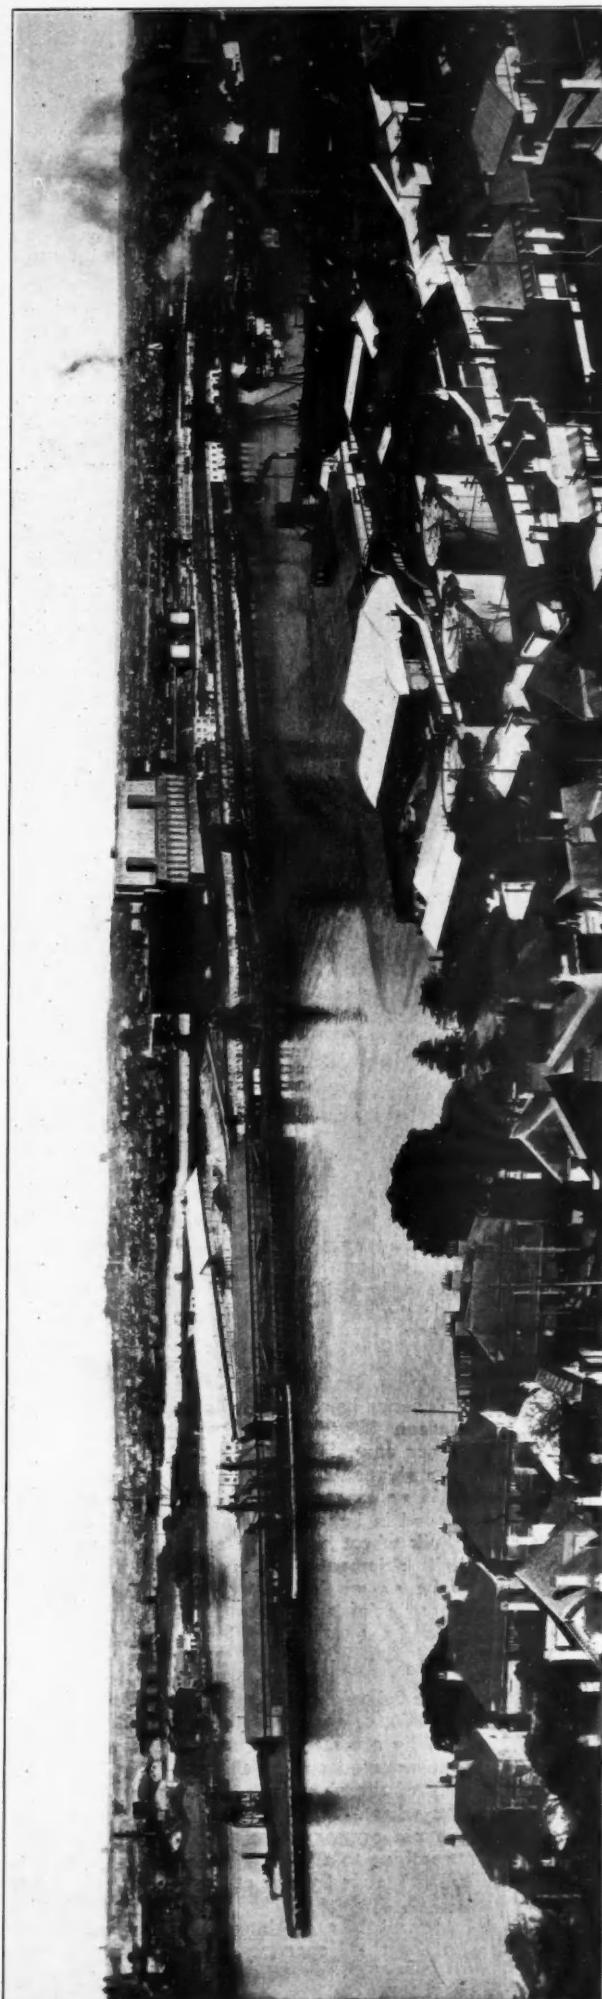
Panoramic View of Glebe Island Wheat Loading Terminal for Bulk and Bagged Wheat.
